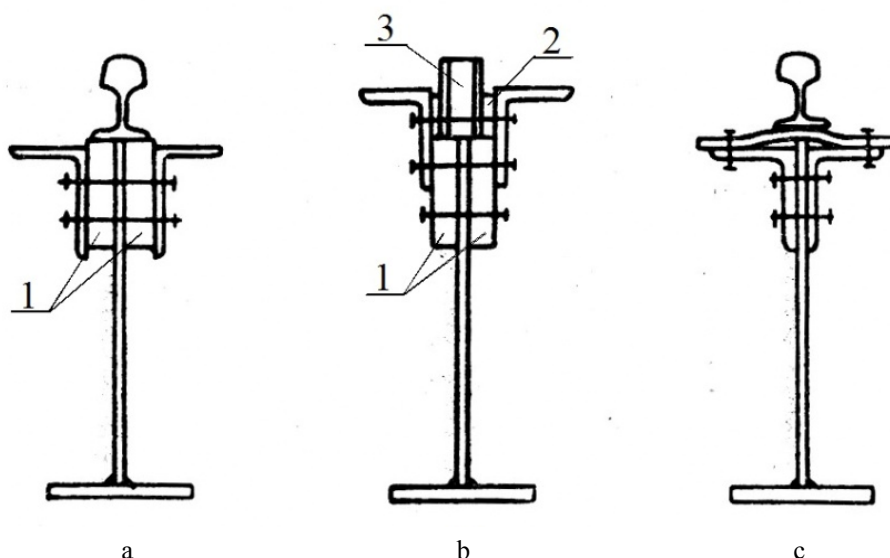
Beam with the upper edge of the wall above (a), below (b) the upper waist belt and convex curvilinear upper waist belt (c): 1 – droppers; 2 – centering pads; 3 – rectangular rail
